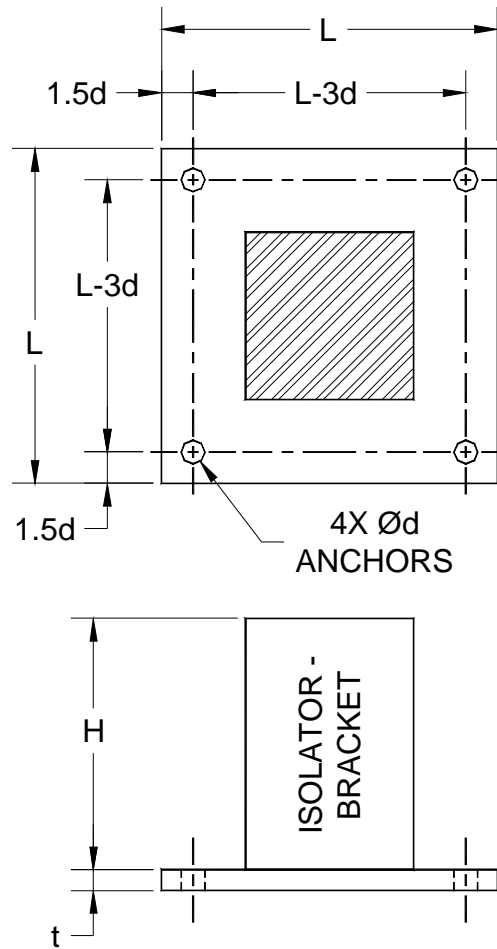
Standard Oversized Base Plate Dimensions
